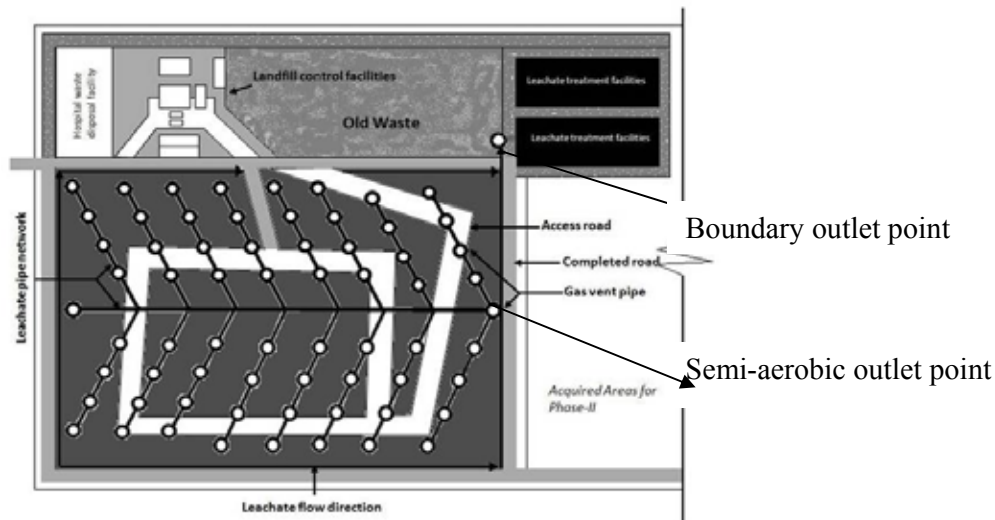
Layout plan of Sanitary Landfill (DCC,2008)
